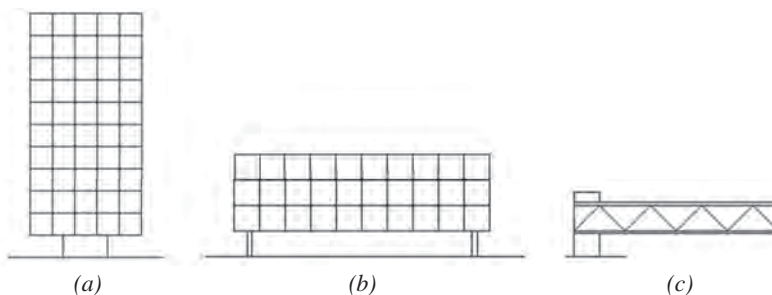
Structural system: (a) cantilever/hanging perimeter; (b) large center span; (c) cantilever.
